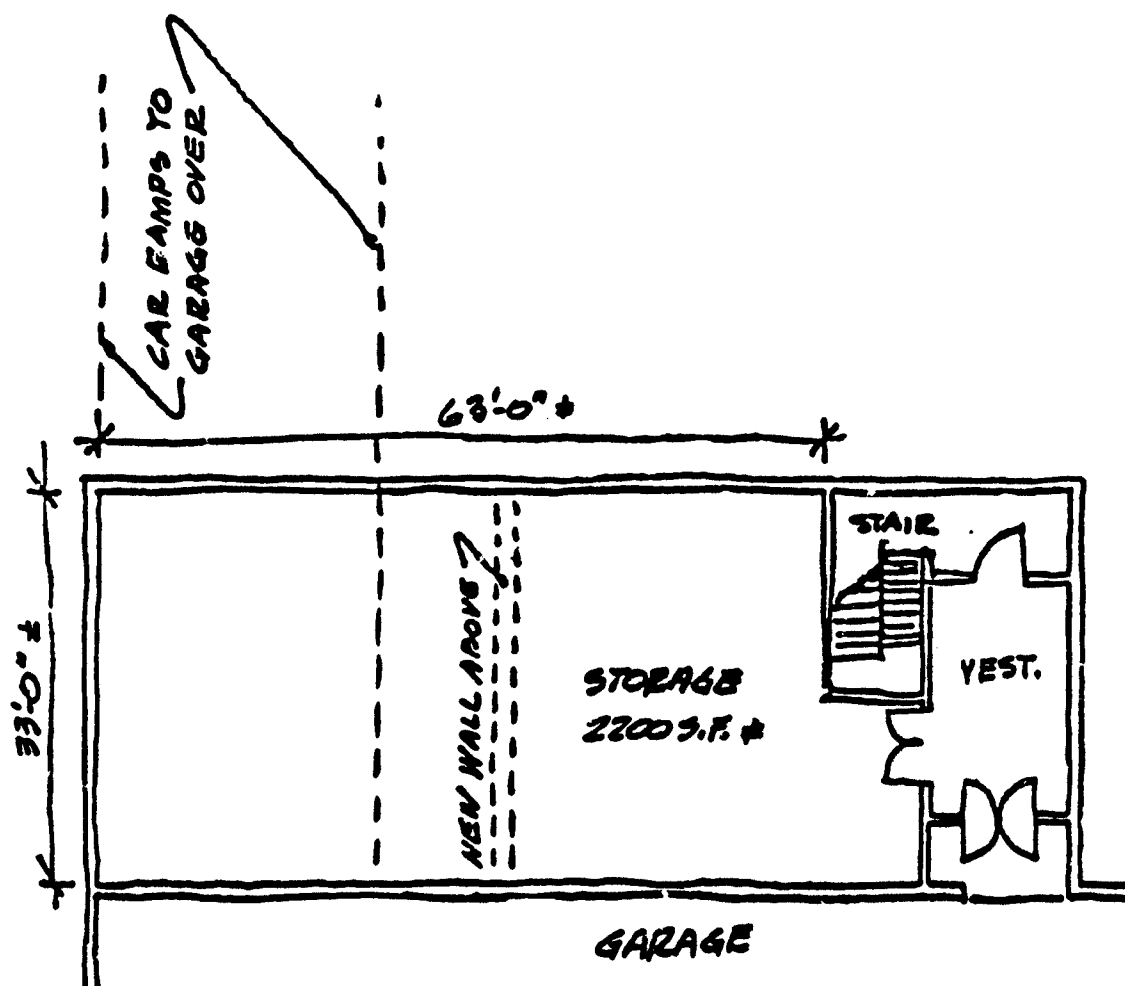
Hospital Alternative #3 -- First Floor Plan
